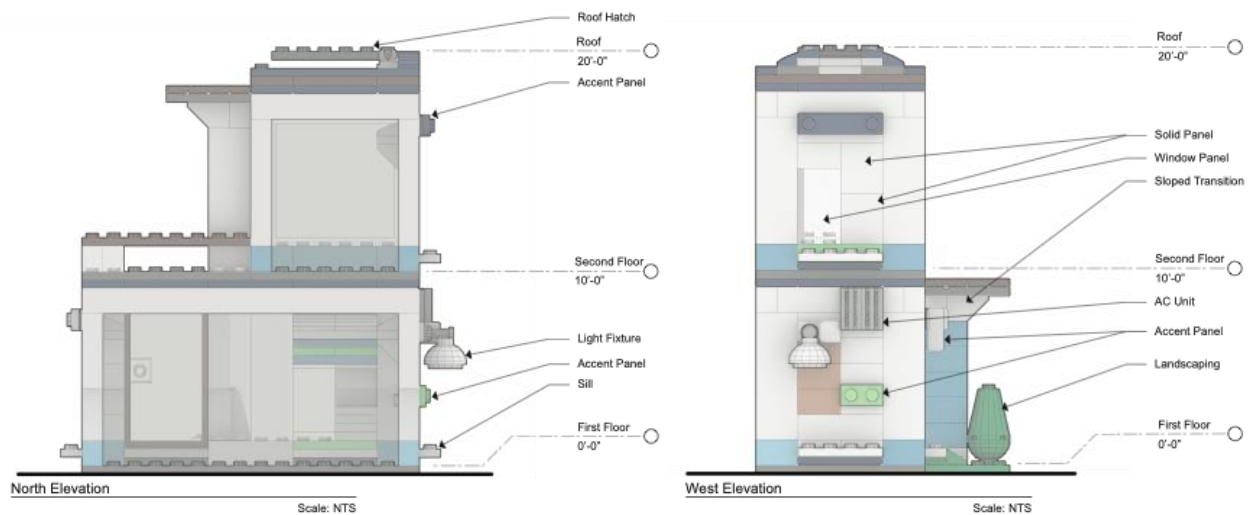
Method 1 required each team to build a LEGO project utilizing traditional stick-built construction with 2D plans, 2D elevations, and a construction schedule
